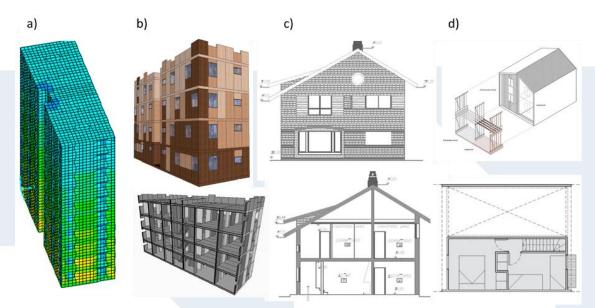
Prototypes of CLT buildings studied: a) 10-floor residential building, b) 4-floor residential building (González et al., 2014), c) single-family dwelling (Daniel Godoy, 2018), and d) social dwelling (Aravena et al., 2012).
